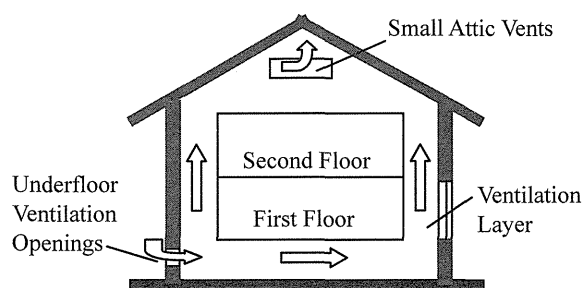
Schematic Drawing of Vertical Section of a House where has a Ventilation Layer between the Outside and the Inside of wall by Outer Wall Insulator Design
